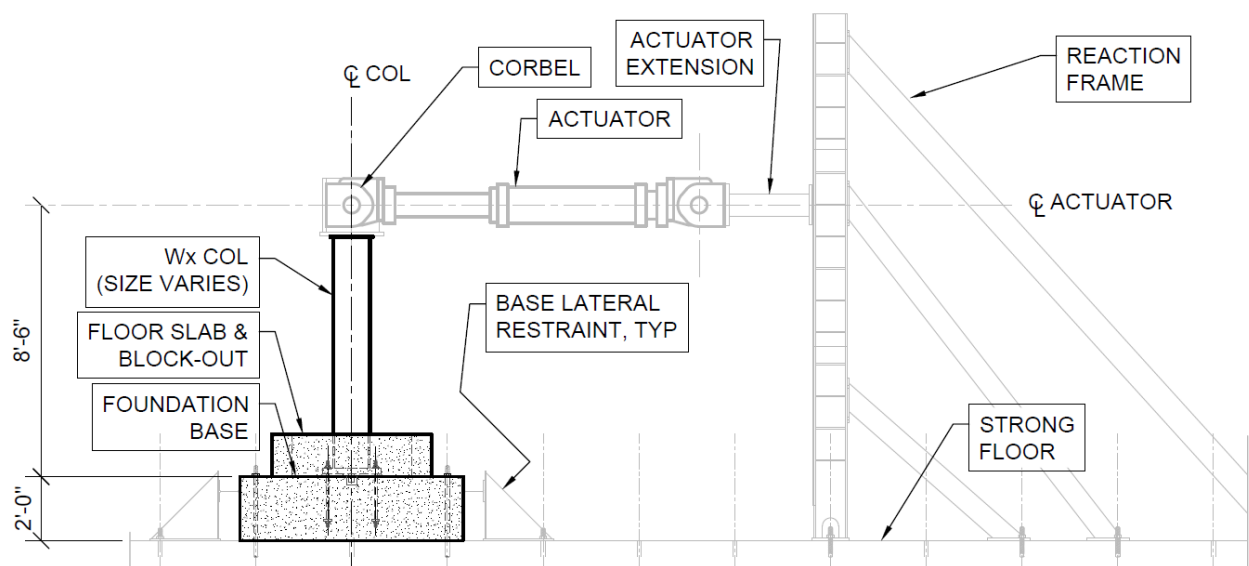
Test Setup General Layout - Elevation View Perpendicular to Loading
